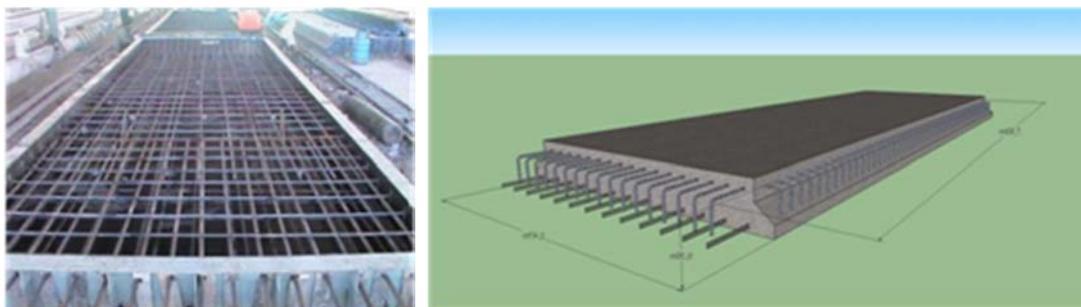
Production of Precast Concrete Slab Prestress, (a) Slab reinforcement, (b) Precast Concrete Slab Prestress
